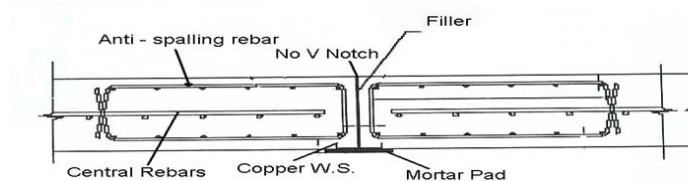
Kárahnjúkar face slab at central compression zone, modified design (Perez, Joahannesson & Stefansson, 2007).
